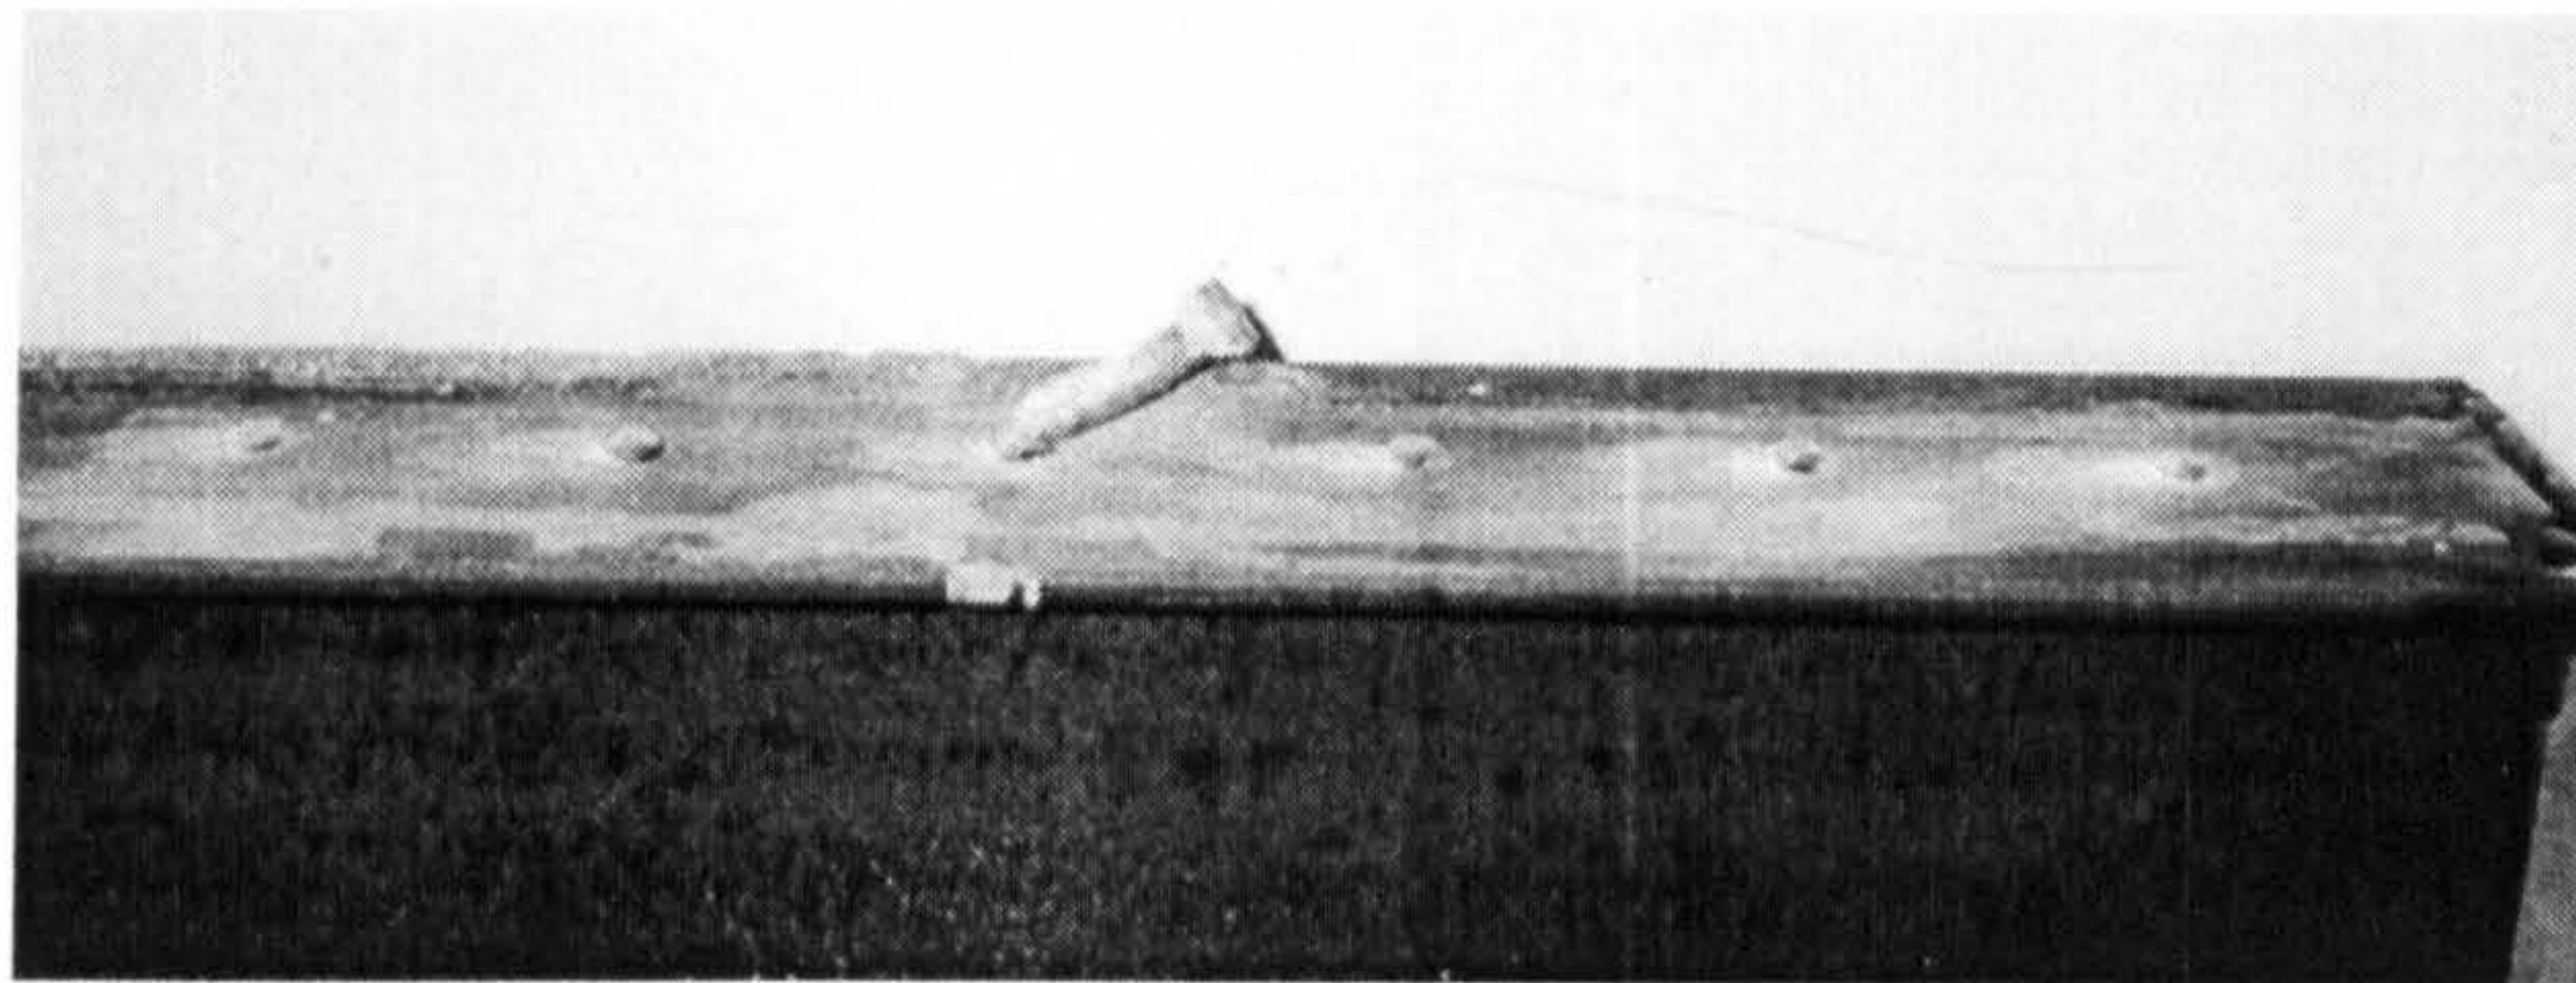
Shear studs for test specimen T 16-C30-200-80 after testing
